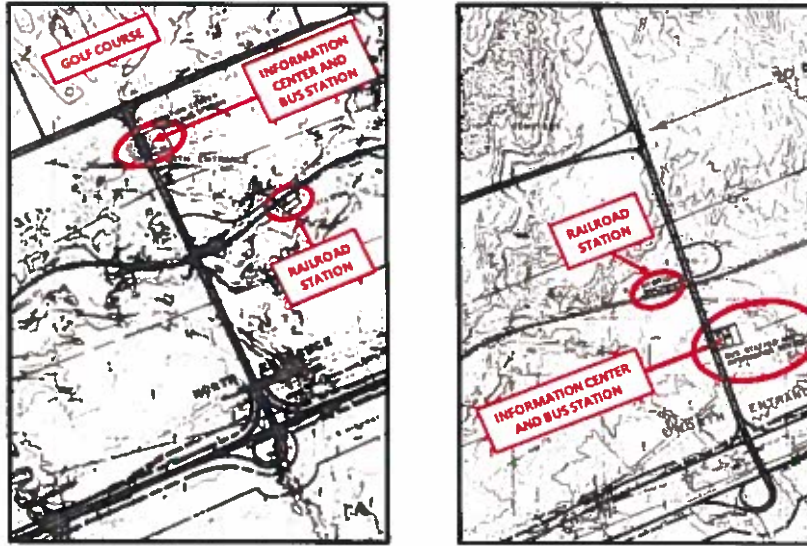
(Left) Plan view of the 1955 North Gate entrance terminating at the golf course. (Right) 1956 Master Plan location of North Gate entrance.
